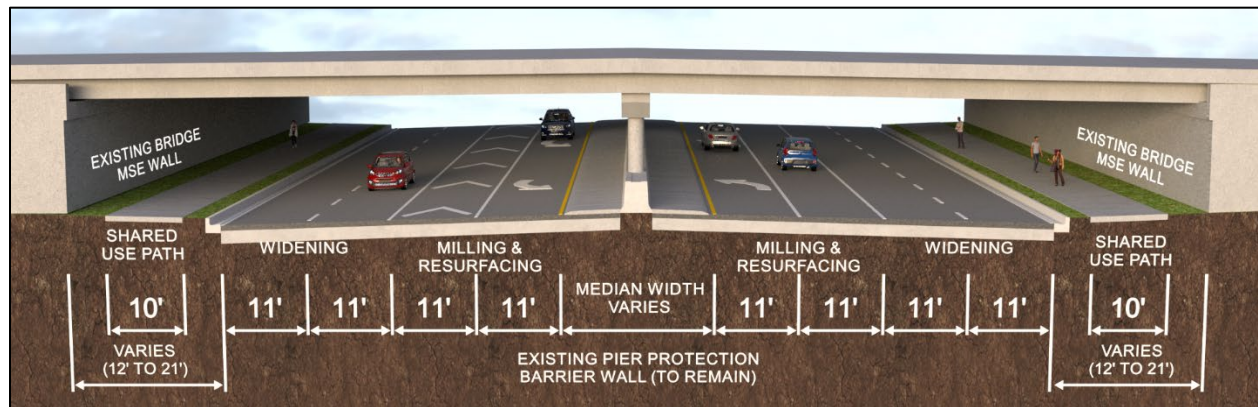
| Branch Forbes Road – Proposed Typical Section Under I-4
